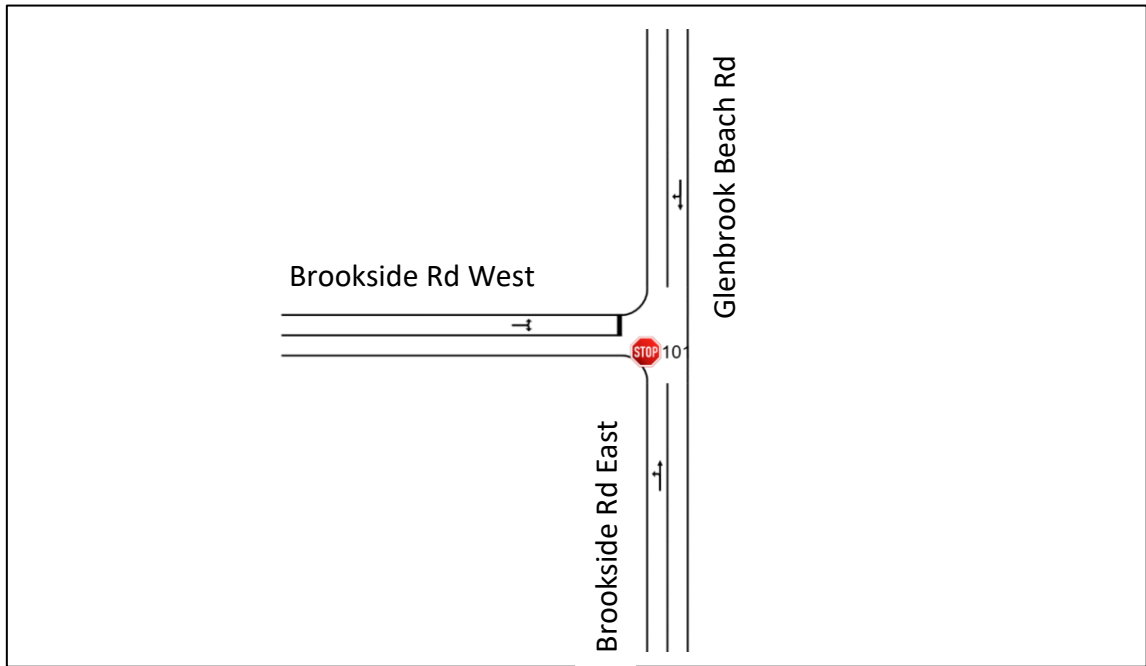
Glenbrook Beach Road / Brookside Road Modelling Layout
